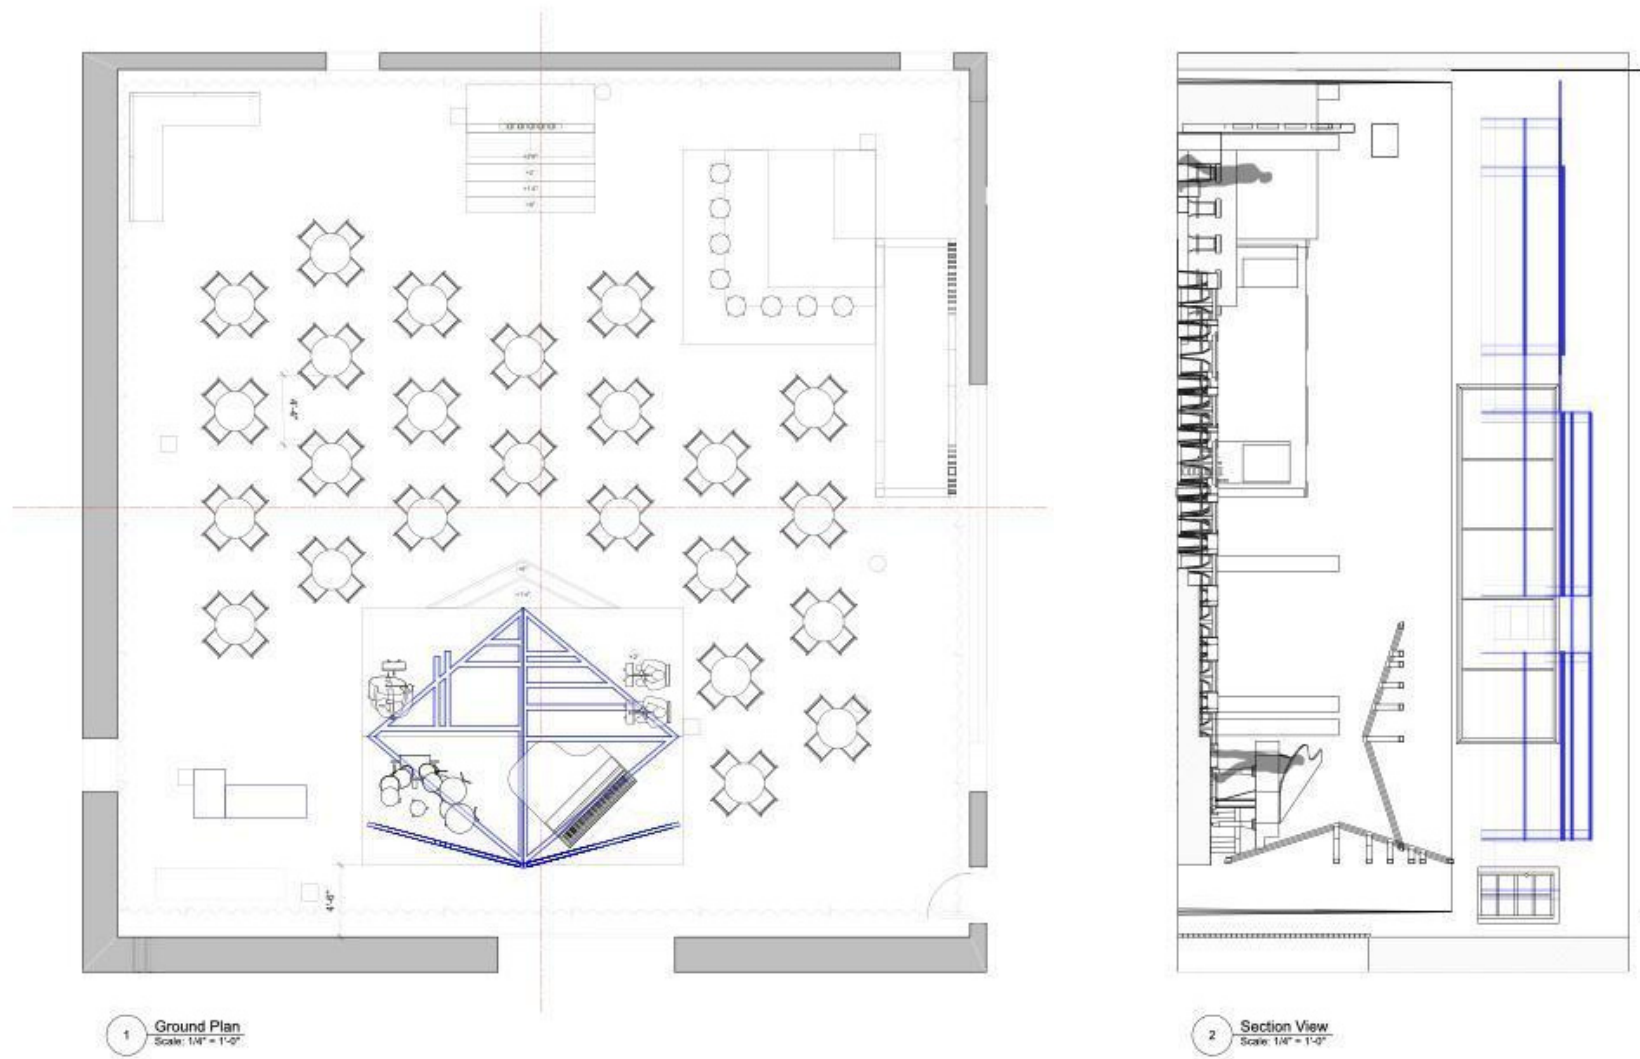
First draft of ground plan and centre line section view and seating layout. Out of scale.
